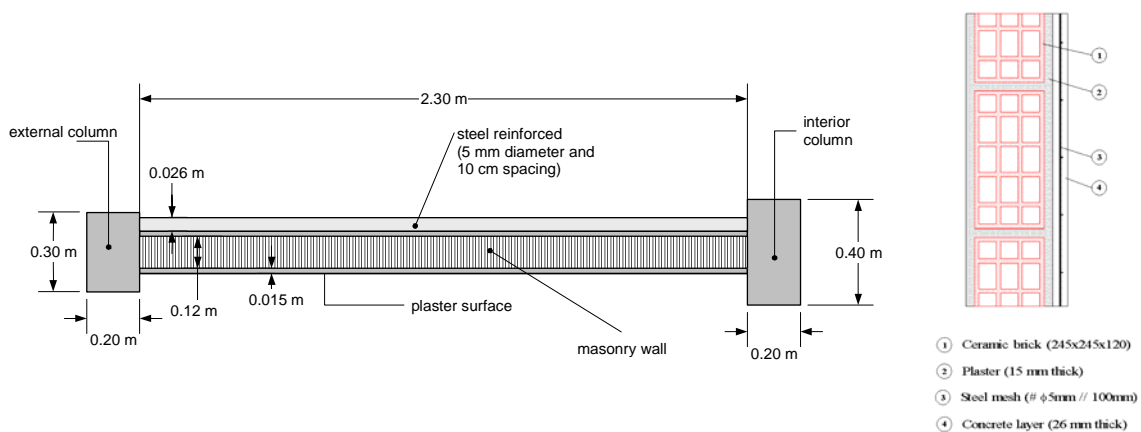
Constructive details (layout and dimensions) of the infill strengthening
